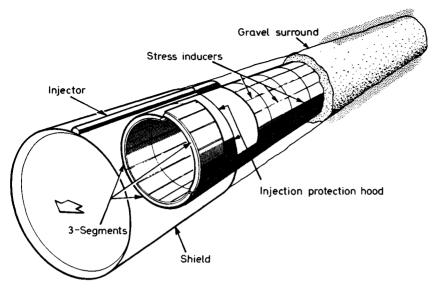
Mini tunnel system. (Courtesy: William F. Rees Ltd)
